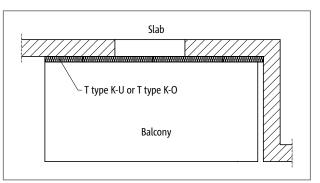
Schöck Isokorb® T type K-U/K-O: Balcony with façade offset
